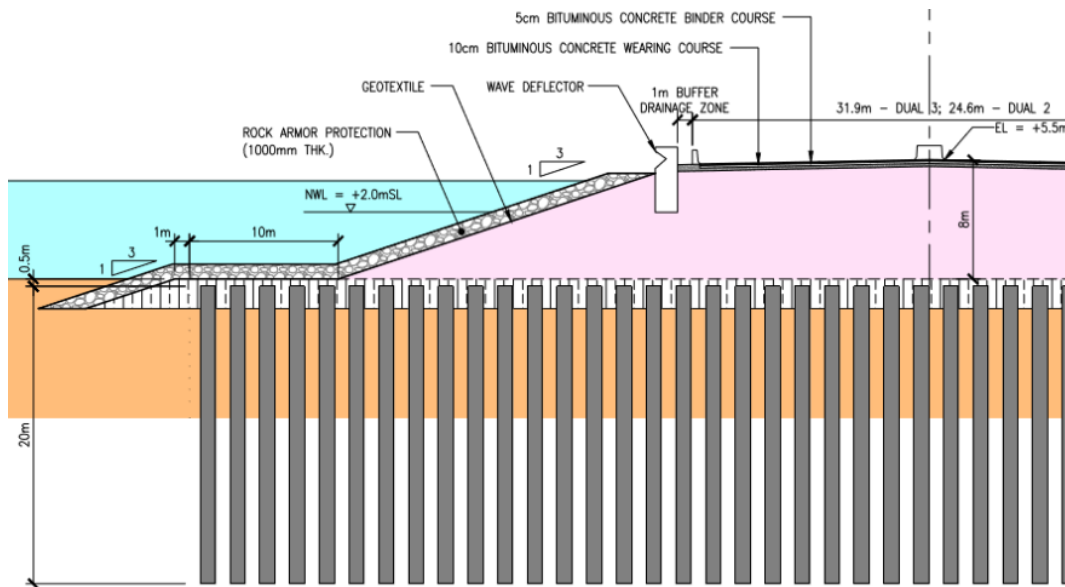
Typical Embankment Foundation Detail with Stone Column ground treatment
